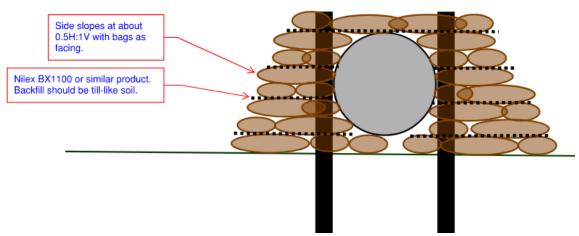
Typical detail for constructing path or working platform at the outfall.
